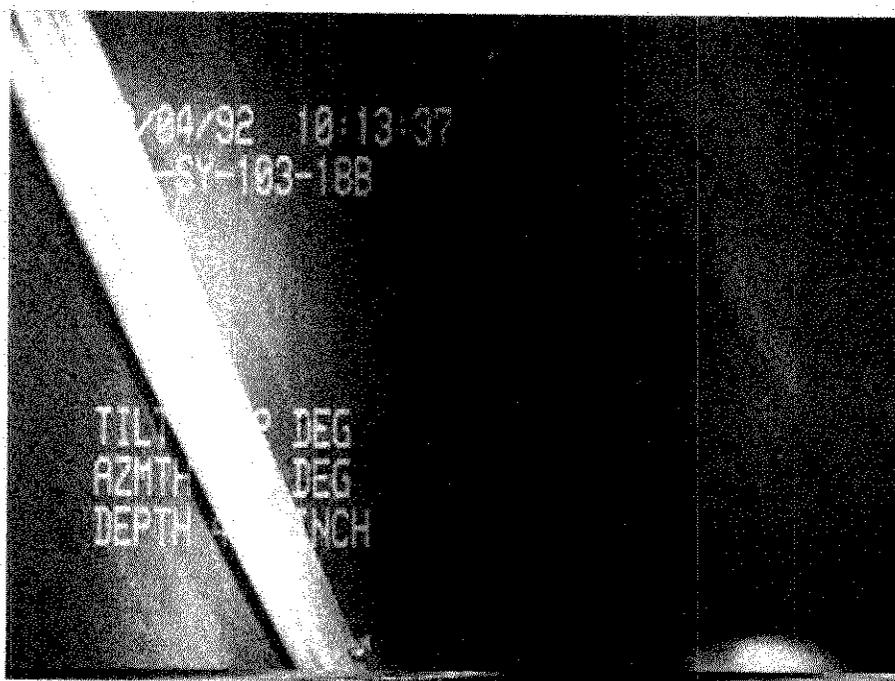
SY-103 Riser 46 (18B), Secondary Tank Wall (Left, 1992)
